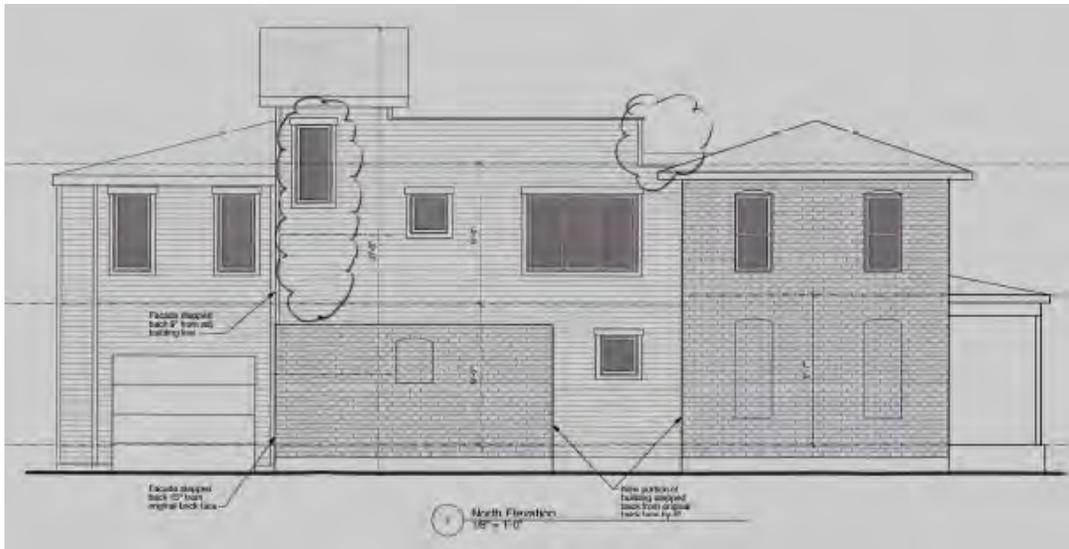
Proposed plans for Rear Addition, 1922 20th St., 2013.
